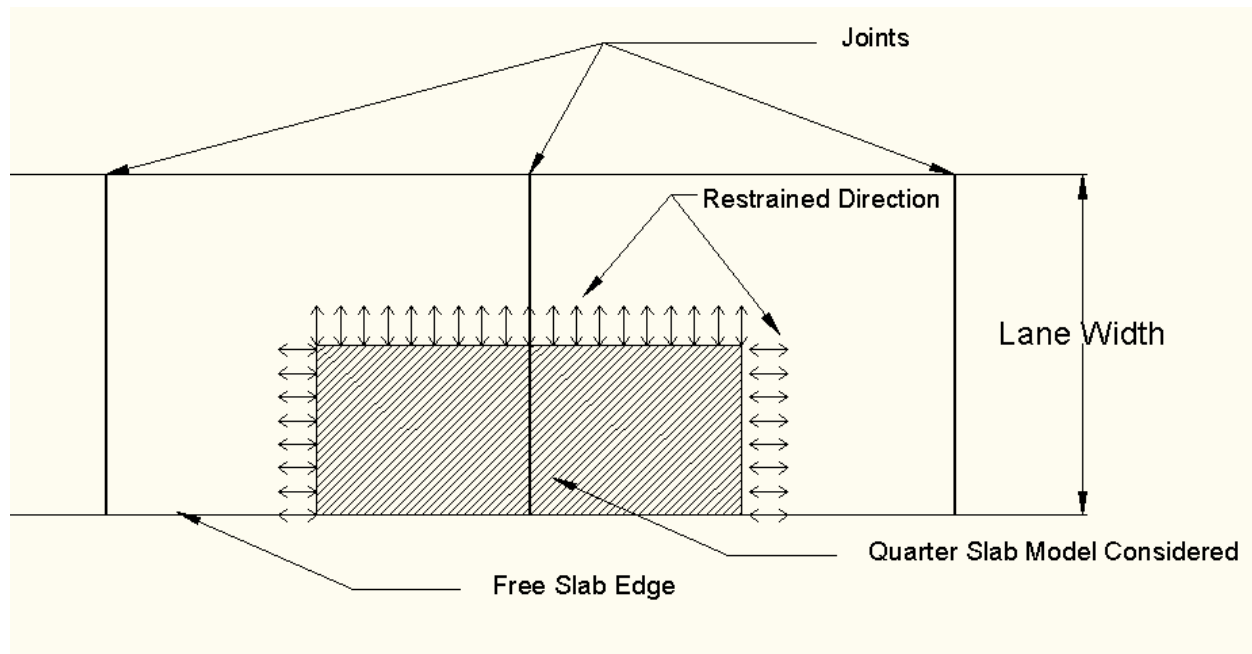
Quarter Slab Model Section of Pavement (Plan View)
